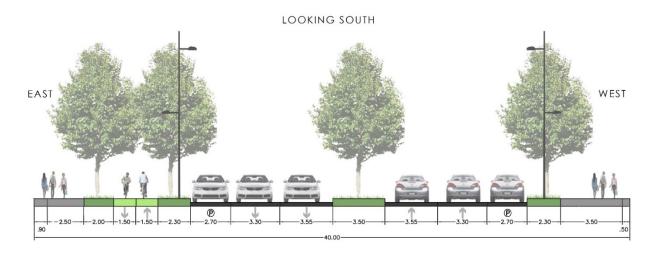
B SHERWOOD DRIVE FROM OAK STREET TO BRENTWOOD BLVD SOUTH (40 M)
